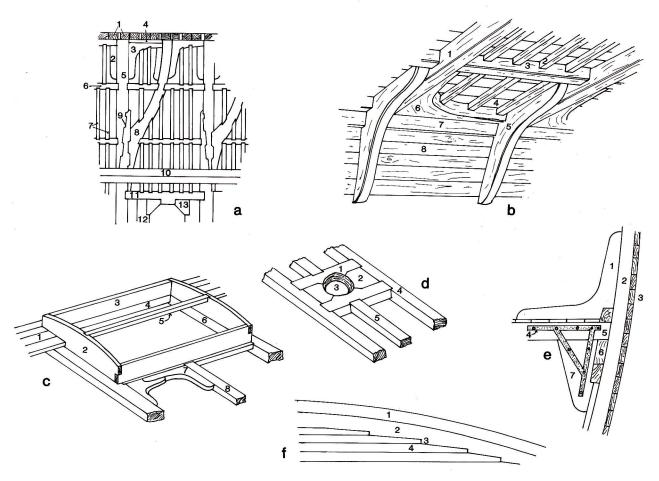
Deck framing and details. [a] deck framing at the mainmast of a large warship: (1) frames; (2) hanging knee; (3) lodging knee; (4) packing piece; (5) deck beam; (6) carlings; (7) ledges; (8) beam arm; (9) deck beam scarf; (10) binding strake; (11) mast carling; (12) mast partner; (13) chock; [b] typical deck framing and supporting features (after John R. Stevens, p. 29): (1) deck beam; (2) ledge; (3) carling; (4) deck planking; (5) hanging knee; (6) lodging knee; (7) shelf clamp; (8) ceiling [quickwork]; [c] a common form of hatch construction; (1) deck planking; (2) head ledge; (3) hatch coaming; (4) carling; (5) hatch beam; (6) deck beam; (7) lodging knee [only one set shown]; (8) half beam; [d] a typical mast partner for small merchant ship: the partners are (1) carlings and (2) chocks; (3) mast hole; (4) deck beam; (5) half beam; [e] standing and plate knees: (1) standing knee; (2) frame; (3) outer planking; (4) plate knee; (5) deck beam; (6) shelf clamp; (7) chock; [f] a method of terminating deck planks at the incurving sides of ships: (1) waterway; (2) nibbing strake [margin plank]; (3) nibbed end; (4) deck plank.
